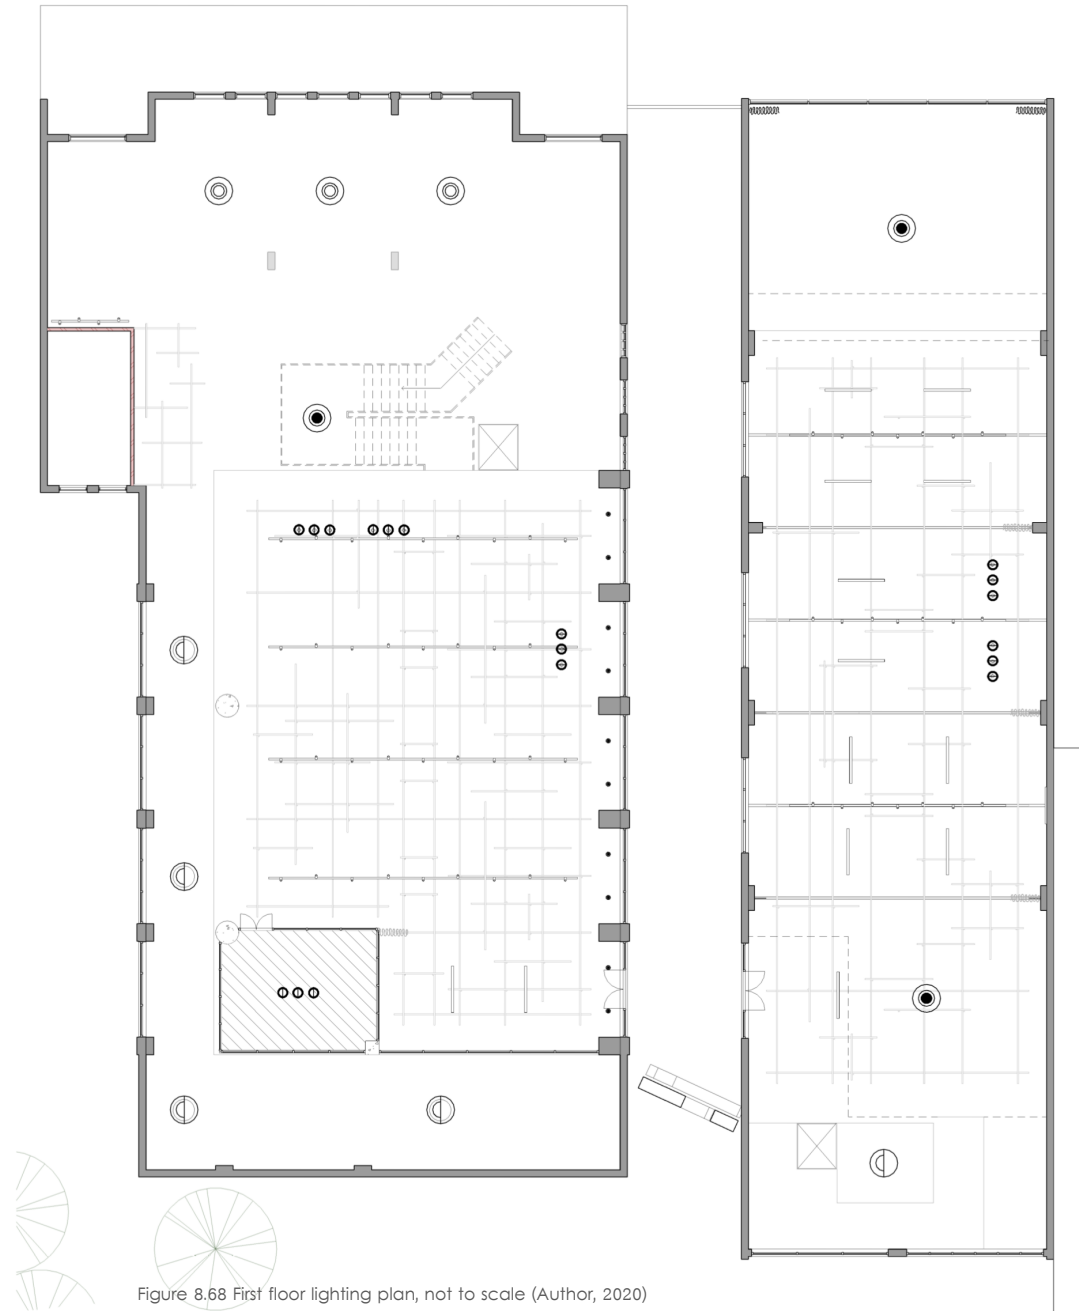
First floor lighting plan, not to scale (Author, 2020)
